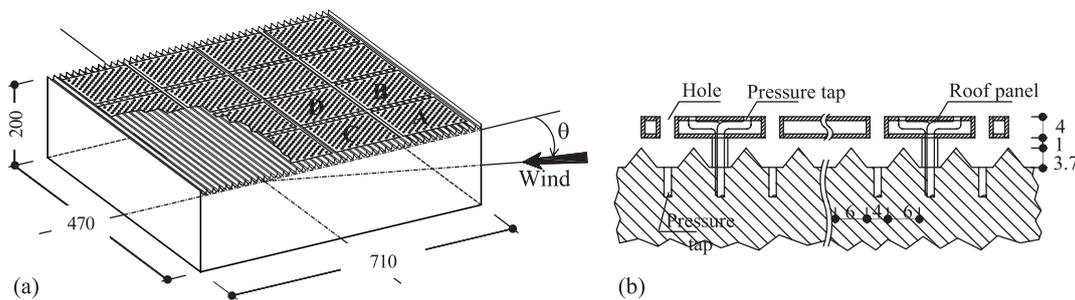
Test model (all dimensions in mm): (a) Geometry of test model; (b) Detail of roof section.
